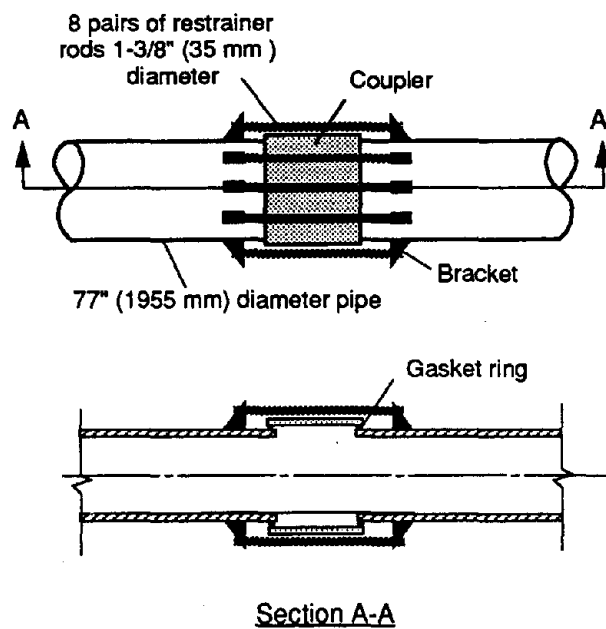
Schematic drawing of connection of the two steel pipe sections which were pulled apart during the earthquake.
